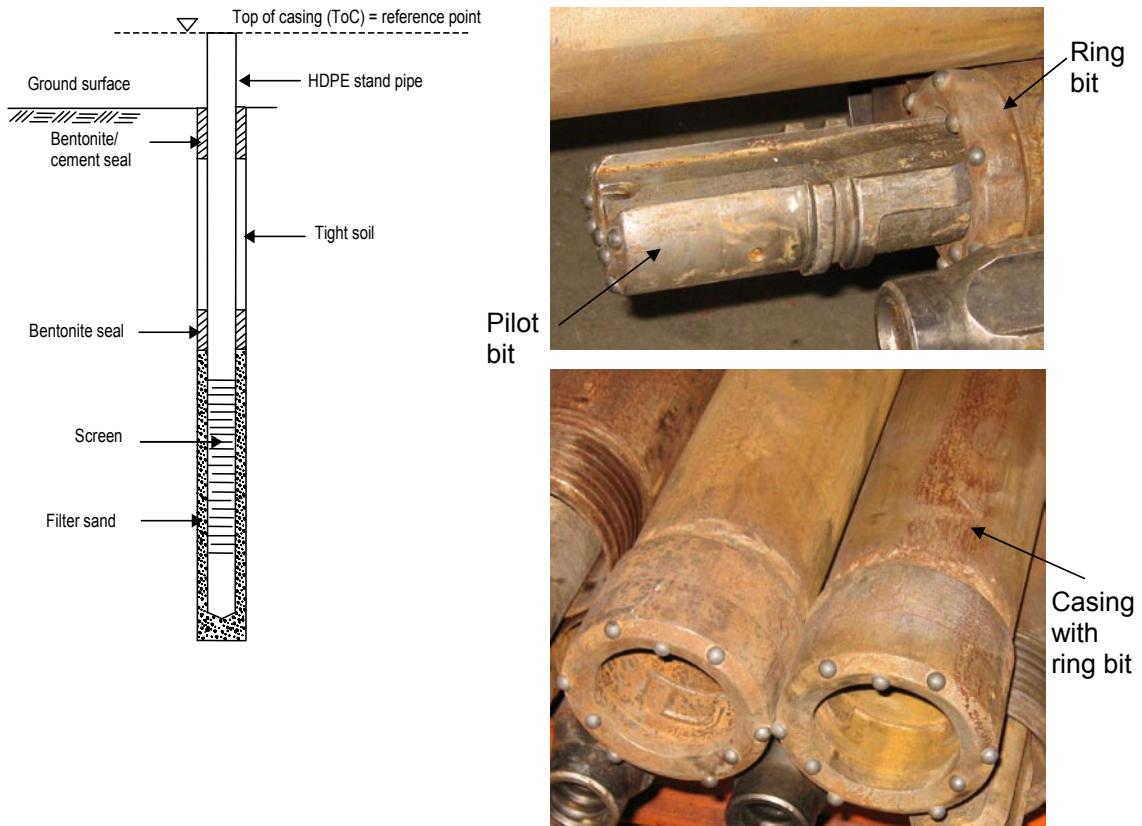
Schematics of soil well construction (left) and centric ring bit 90 mm (bottom right) with pilot bit (topright) was used for soil well installation.
